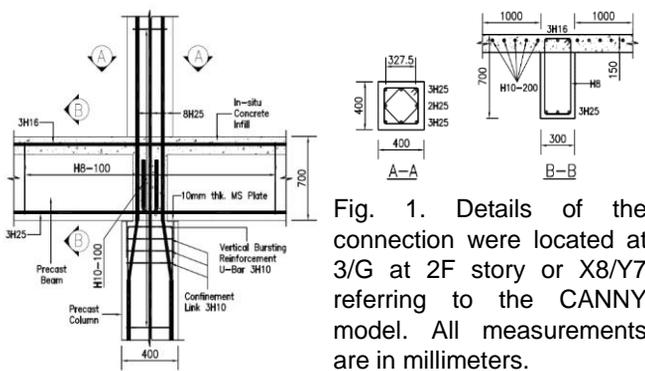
Details of the connection were located at 3/G at 2F story or X8/Y7 referring to the CANNY model. All measurements are in millimeters.
